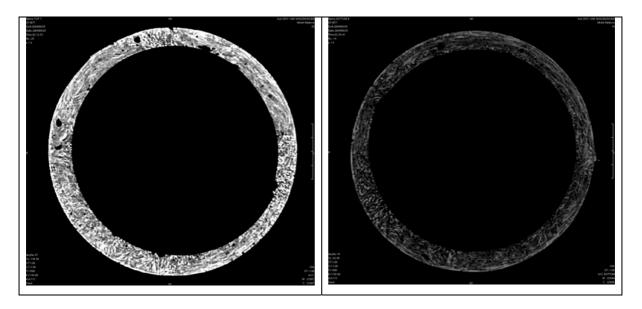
CT scan images of cast steel fibre reinforced ECC pipe
